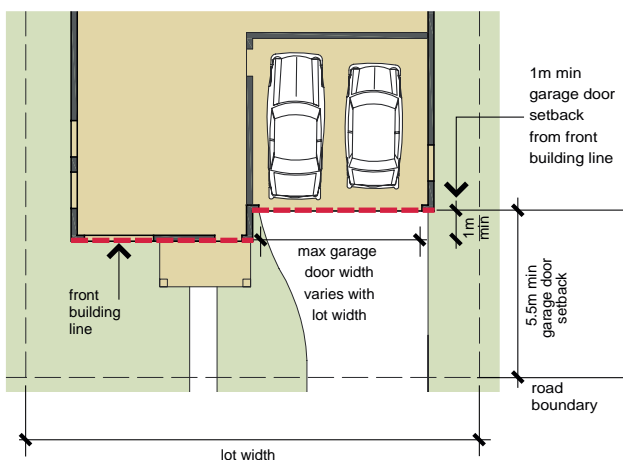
Minimum garage setbacks and maximum garage door sizes
